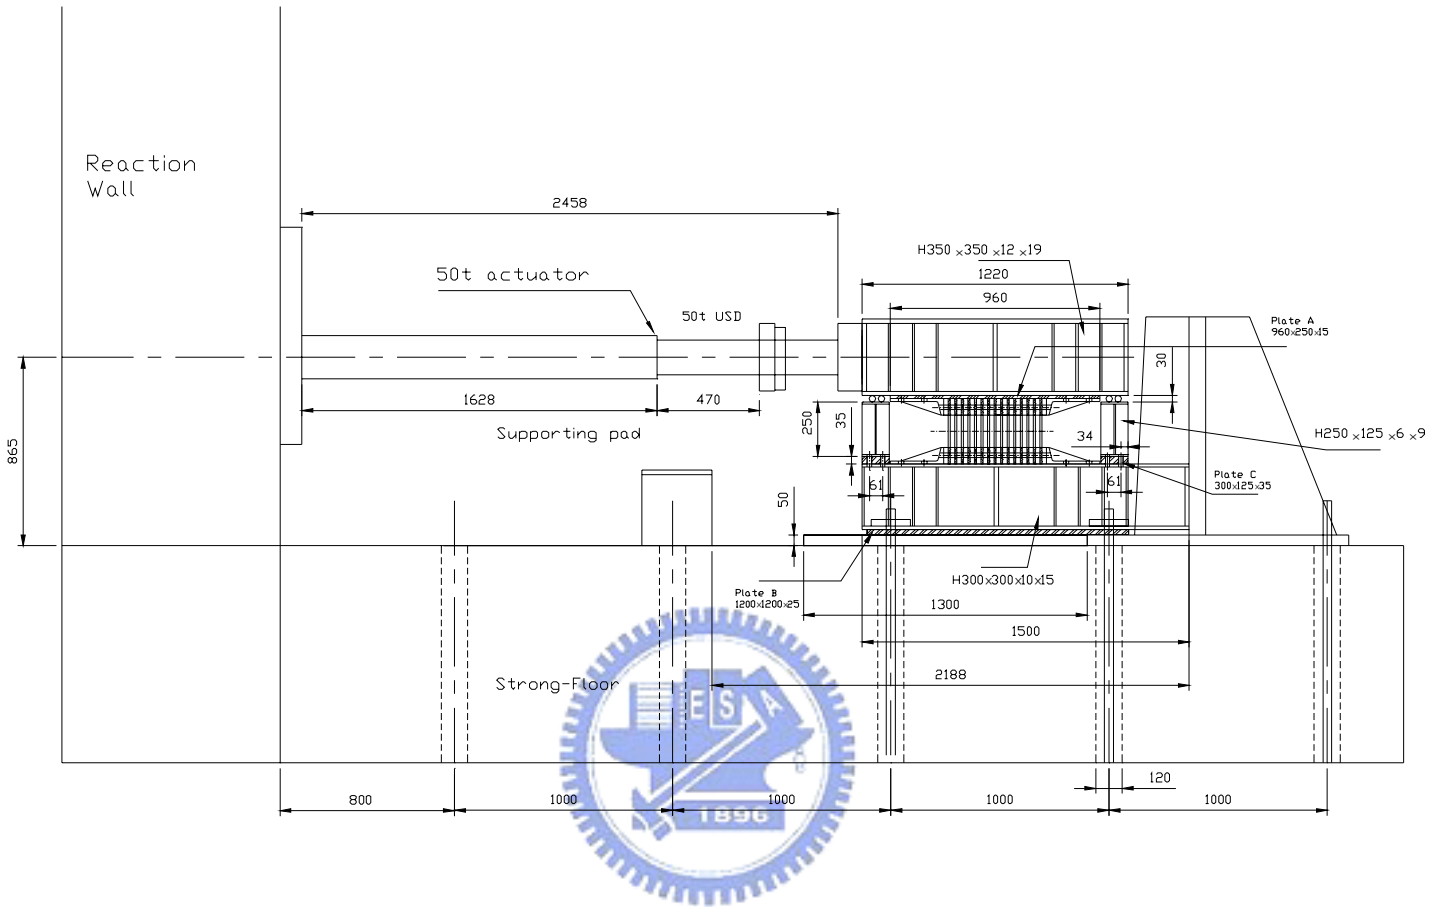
Design sketch of the testing platform for component test of a full-scale damper (Unit: mm)
